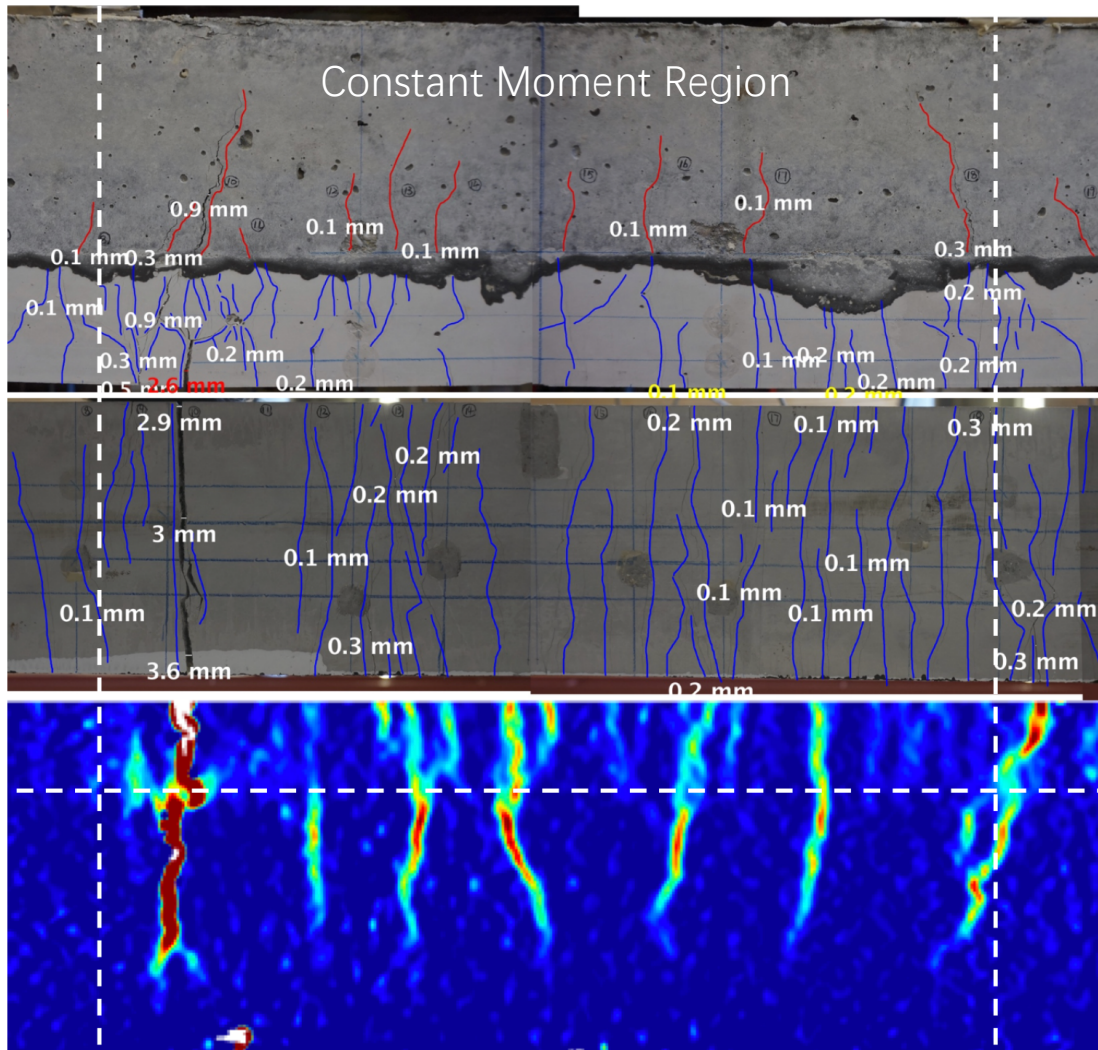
Crack pattern of Test 03 (beam with SHCC layer of 70 mm)
